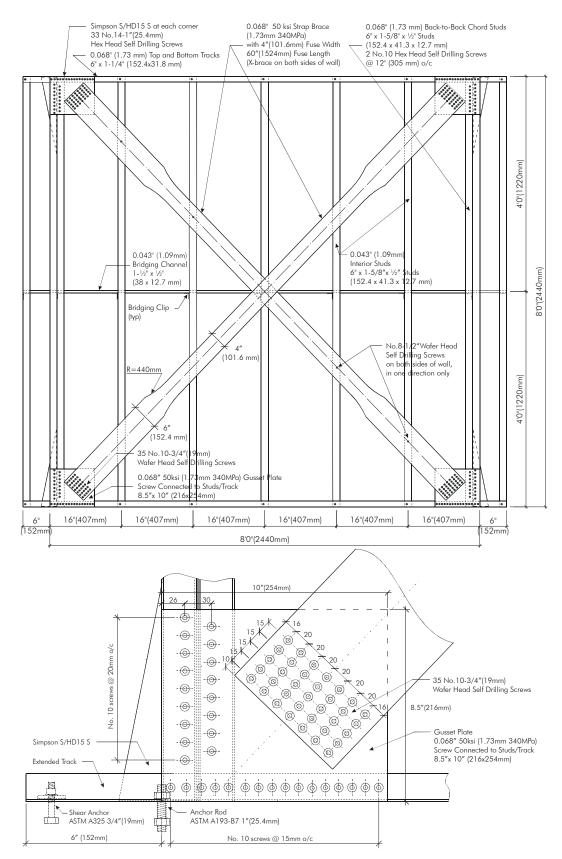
Nominal dimensions and corner detail of specimens 33A-M and 34A-C
